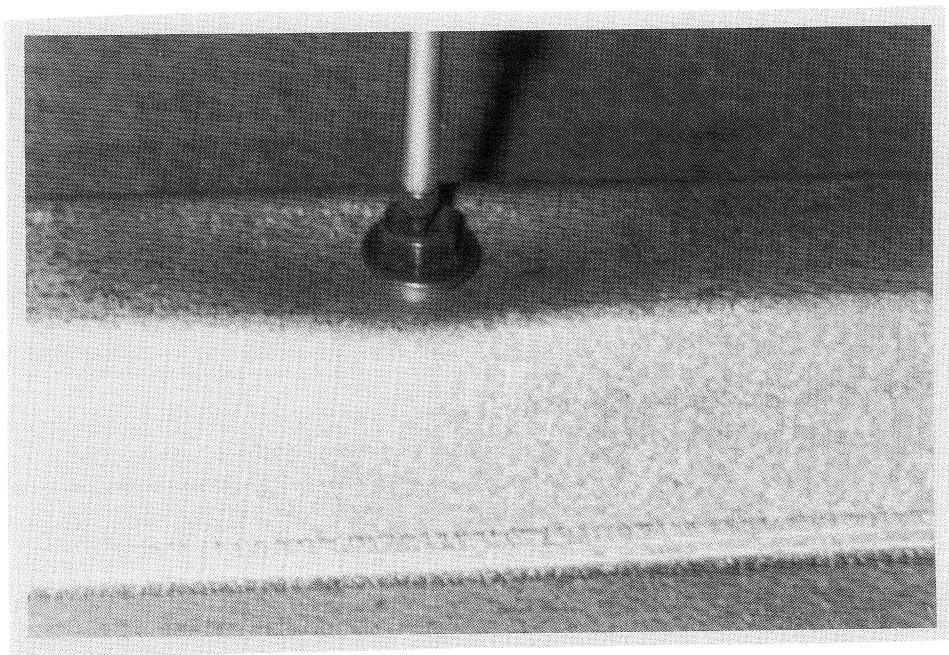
Trapezoidal Roofing after a Higher Load Cycle
